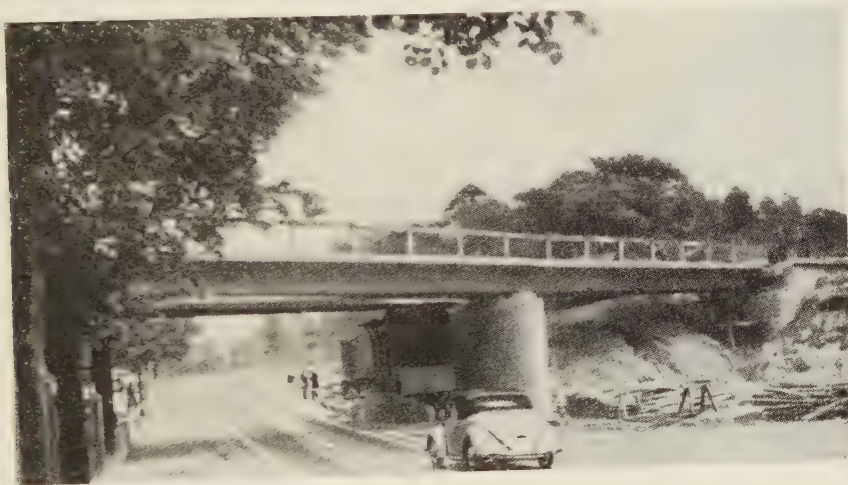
View of the new bridge over the Morfeld-Frankfort (Main) road after the first deck was placed in position.
